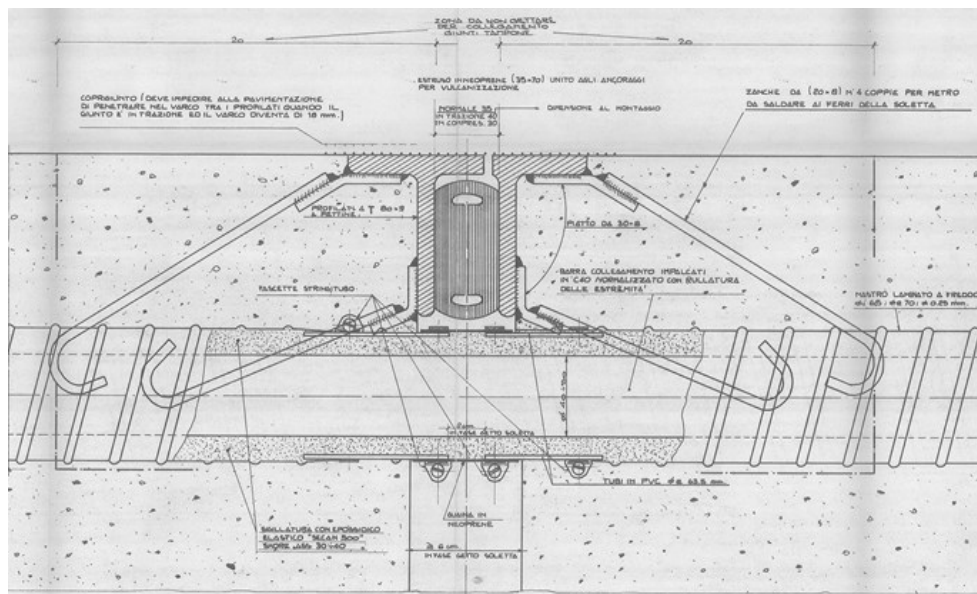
Detail of the joining elements between the decks (link slabs). Source: design project of the road links among SS76 road, A14 highway, Falconara airport and SS16 road, ANAS, 18.02. 1986.
